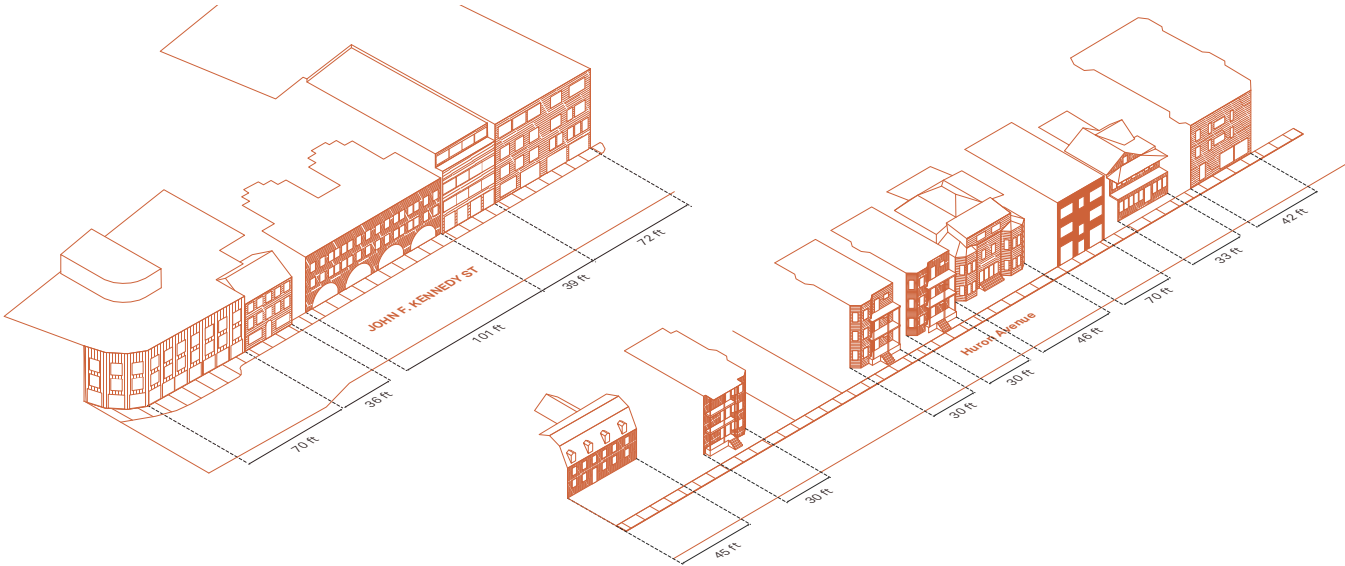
Isometric drawings of street facades and setbacks shows how, even along a single block, setbacks, building & facade types vary widely.
